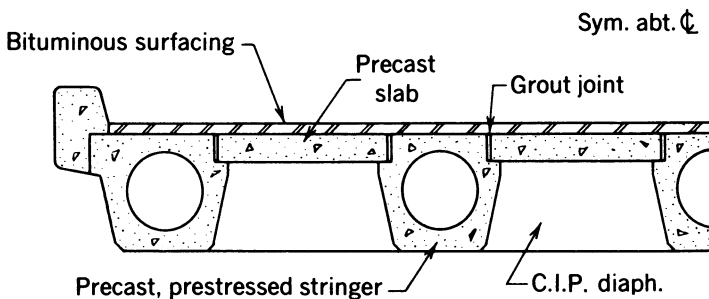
Half-section of a bridge with precast deck slabs.
